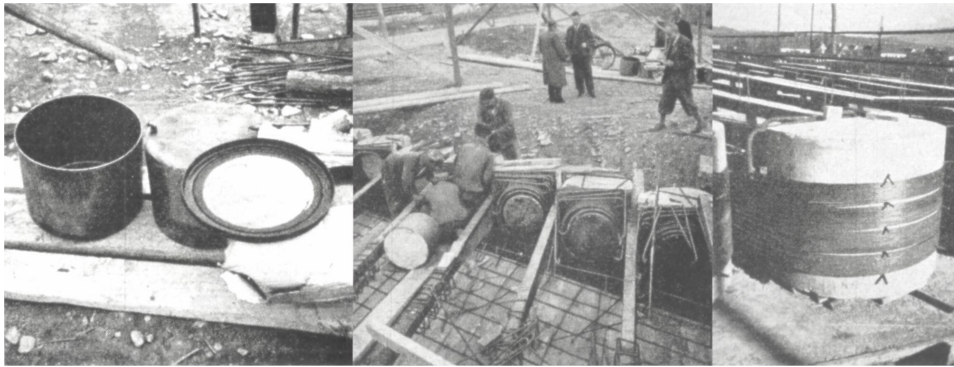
Cooking pots and chuck heads before and after installation into the Elzbrücke at Emmendingen (Lämmlein and Bauer 1950, Abb. 7-9)
